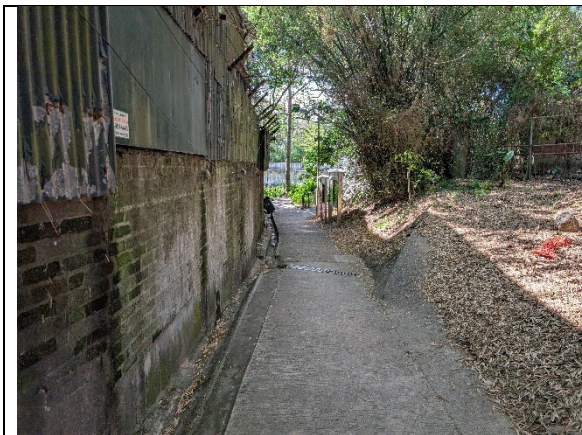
Existing 300mm U-channel running between the eastern subject site boundary and an existing external footpath (2 of 3)
